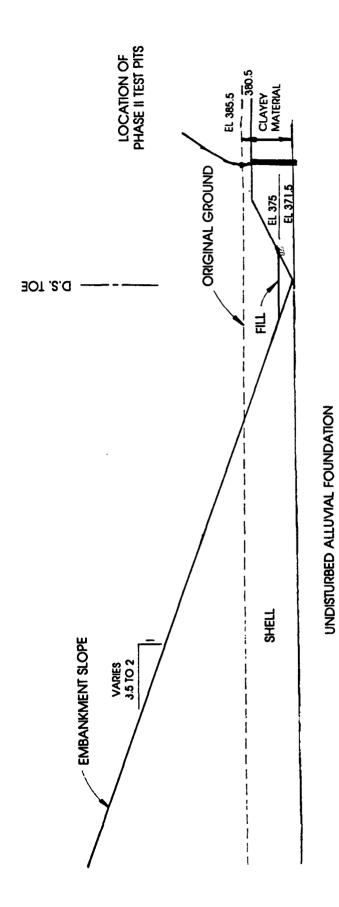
Typical section of downstream toe between sta 439 and sta 446 showing undredged foundation conditions
